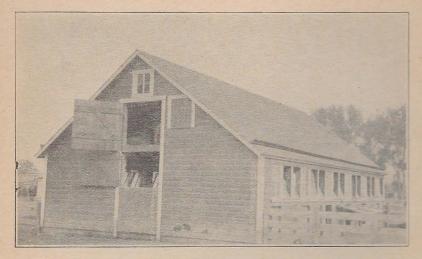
North and south type hog house with loft and side windows. Plan No. 10.72-14.
